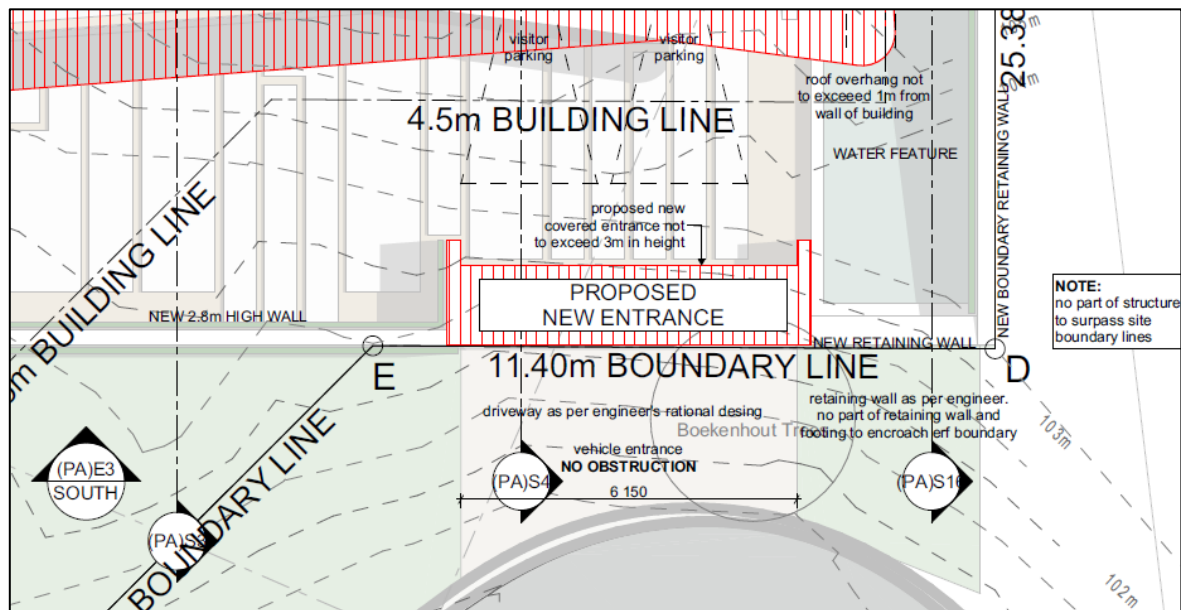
EXTRACT - SITE DEVELOPMENT PLAN
